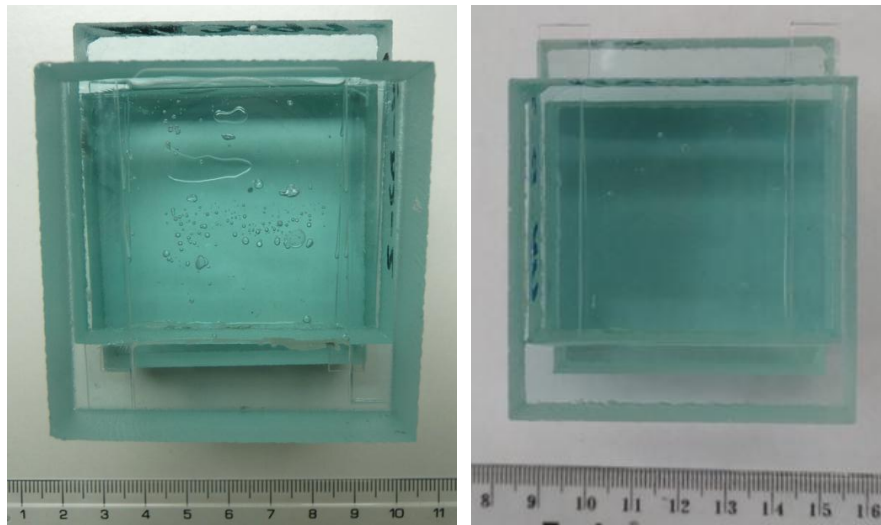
Bonded specimen with bubbles caused by shrinkage (left), better bonded specimen with less bubbles (right)
